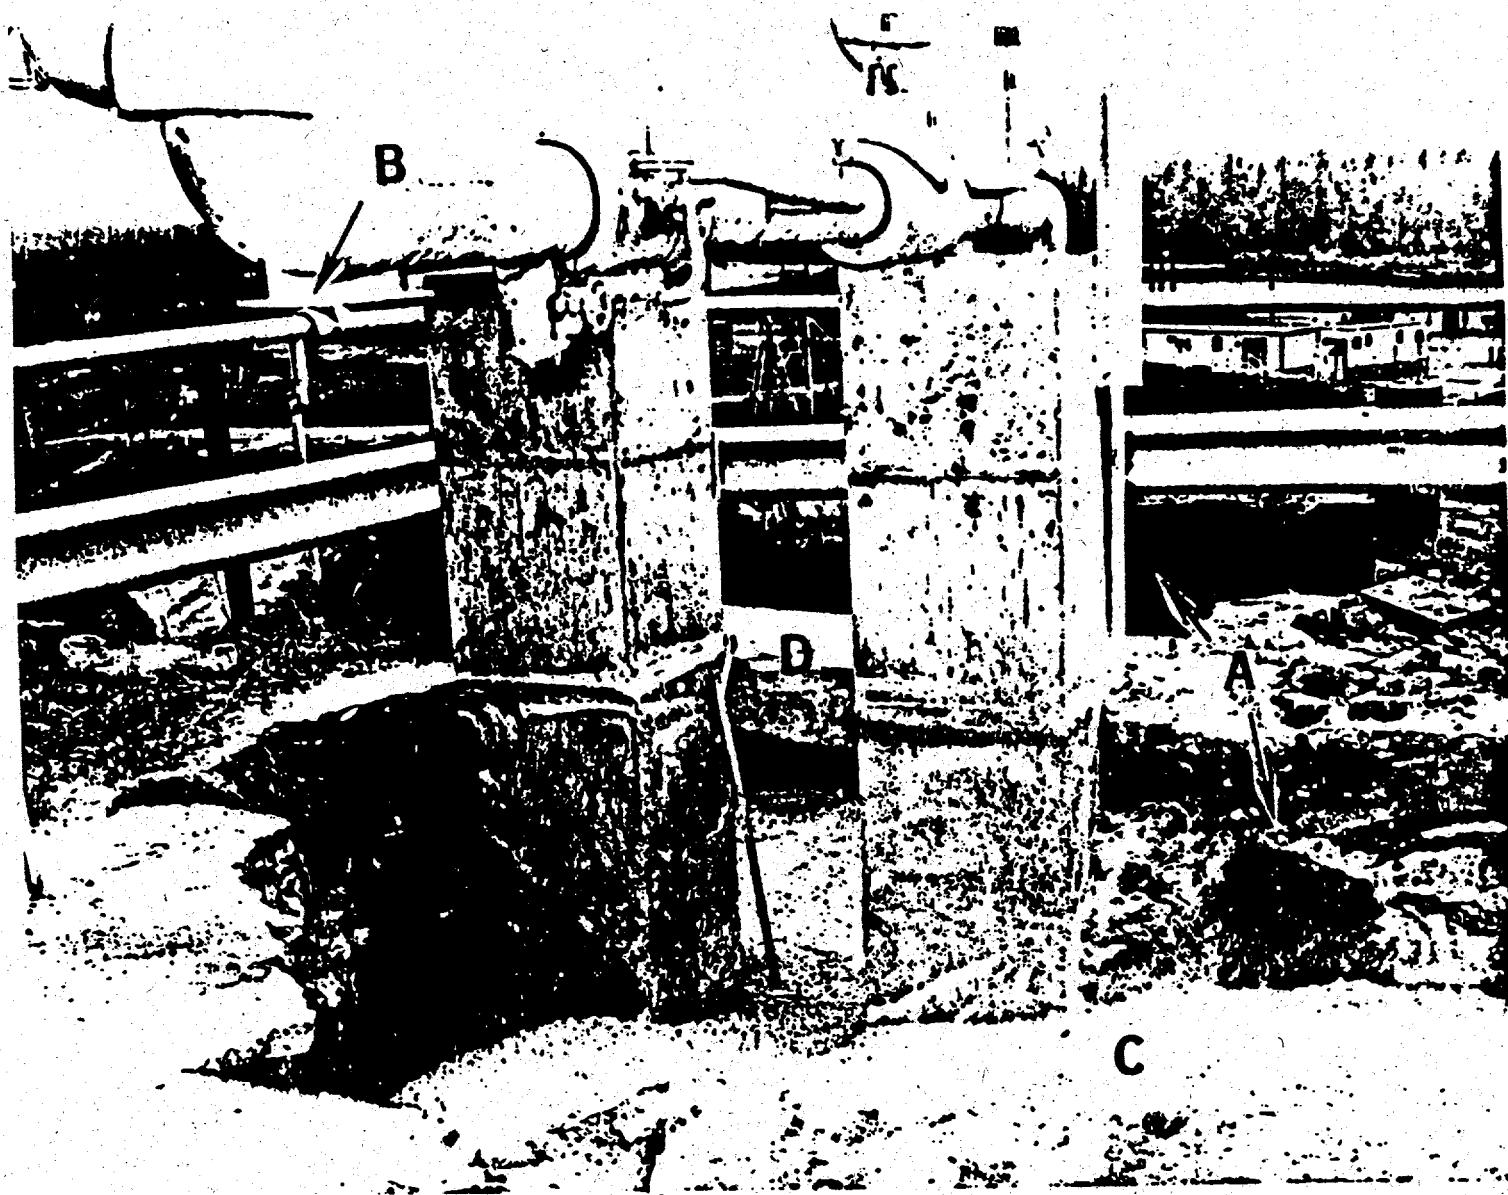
Steam equipment at edge of hill. Large washout (A) occurred due to broken underground water pipe 300 ft. away. The pillar supporting the steam pipe at B fell into the hole and is buried in the aggregate C. Slab D bridges a gap created by the washout. Several buried pipes on the hillside were exposed.
